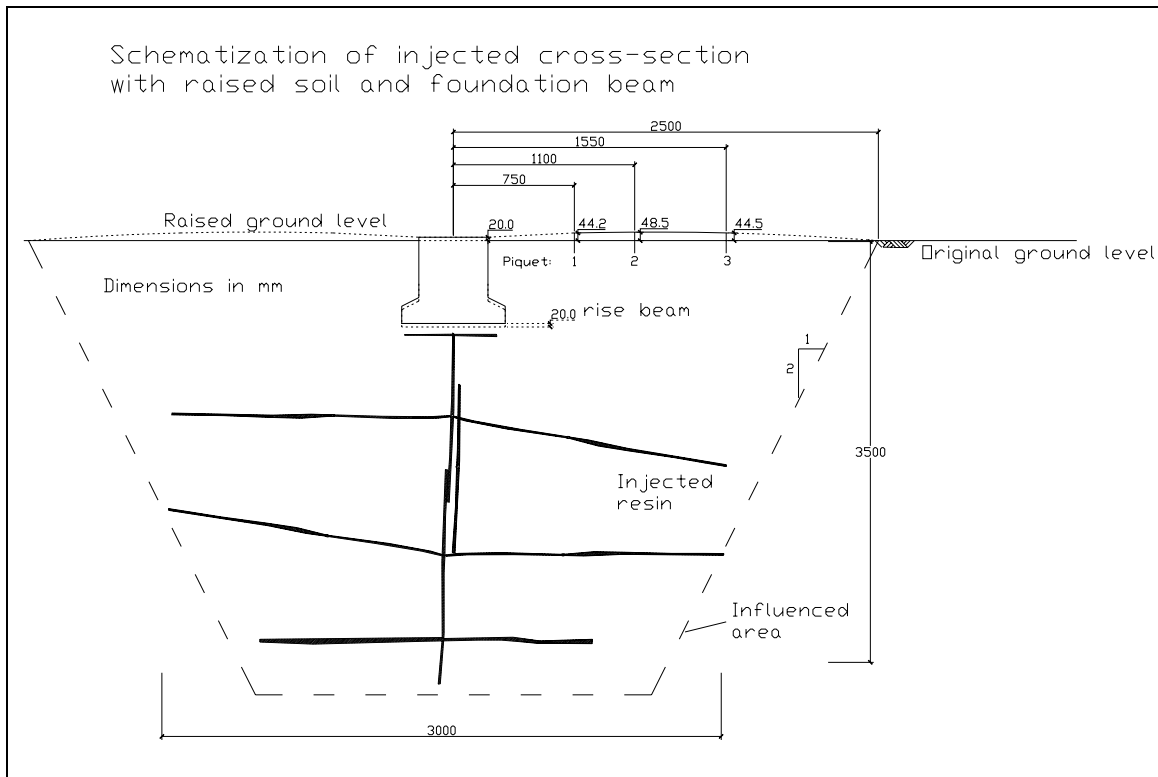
Schematization of a resin injected cross-section under a foundation beam.
